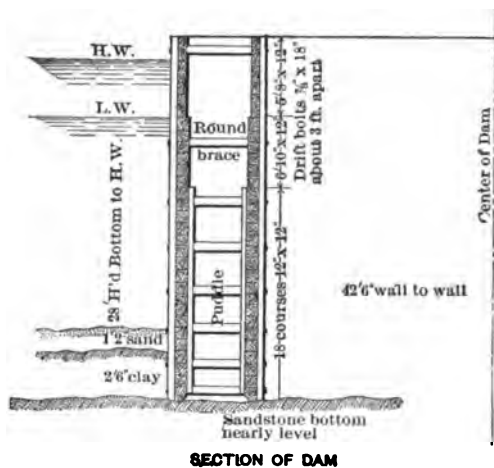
DETAILS OF COPPER-DAM USED ON ARTHUR KILL DRAWBRIDGE
